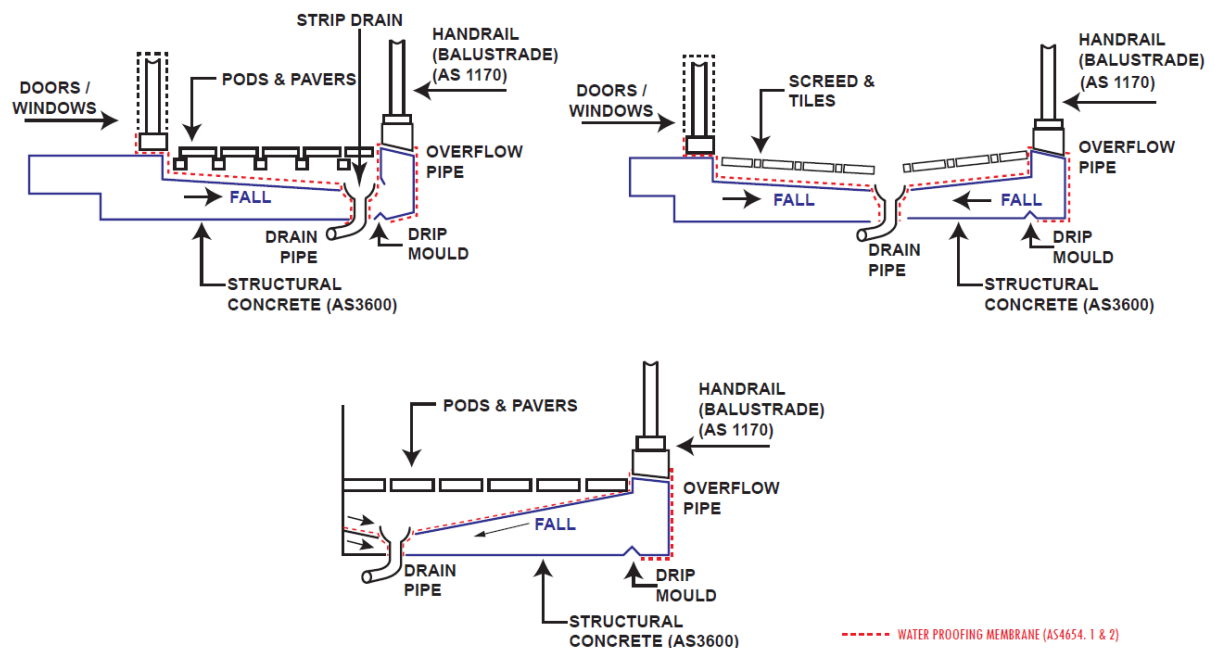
Typical Concrete Balcony Construction Details (Source: SUT team interpretation)
